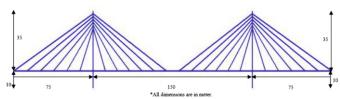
Elevation layout of "PANDIT DINDAYAL UPADHYAY Cablestayed Bridge"
